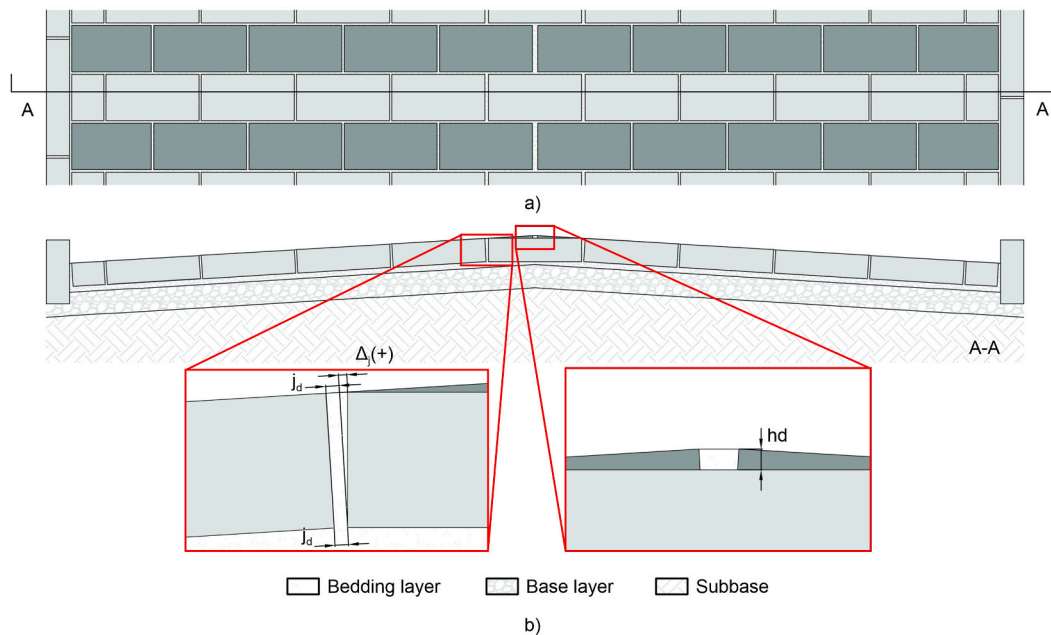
Pavement with straight camber and stretcher bond laying pattern: a) plan view and b) section with emphasis on joint openings and height differences between adjacent elements.
